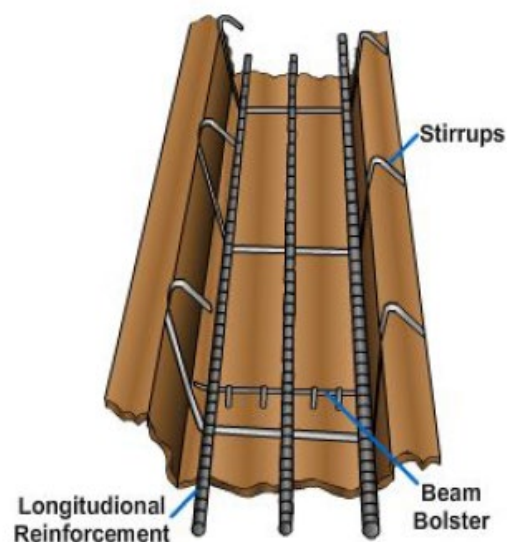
Beam-reinforcing steel supported on beam bolsters.
